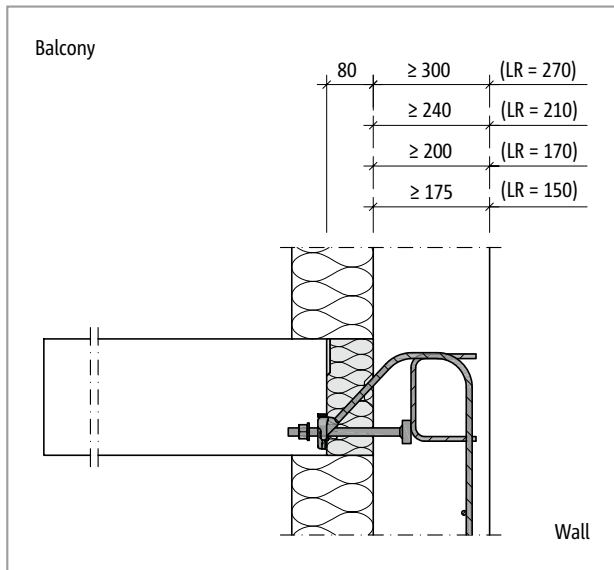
Schöck Isokorb® T type SQ-WU: Special construction for wall connection
